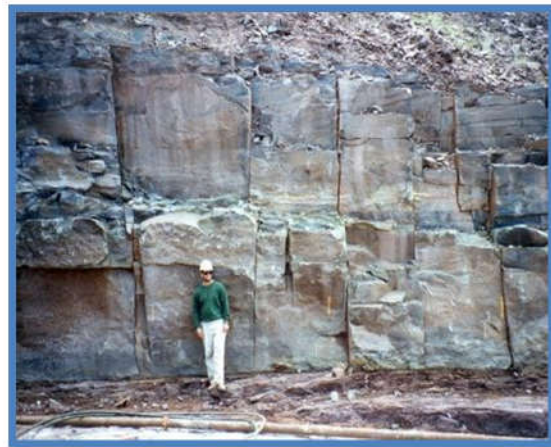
Thick sandstone unit with large, widely spaced vertical fractures terminating at mudstone units located above and below.
